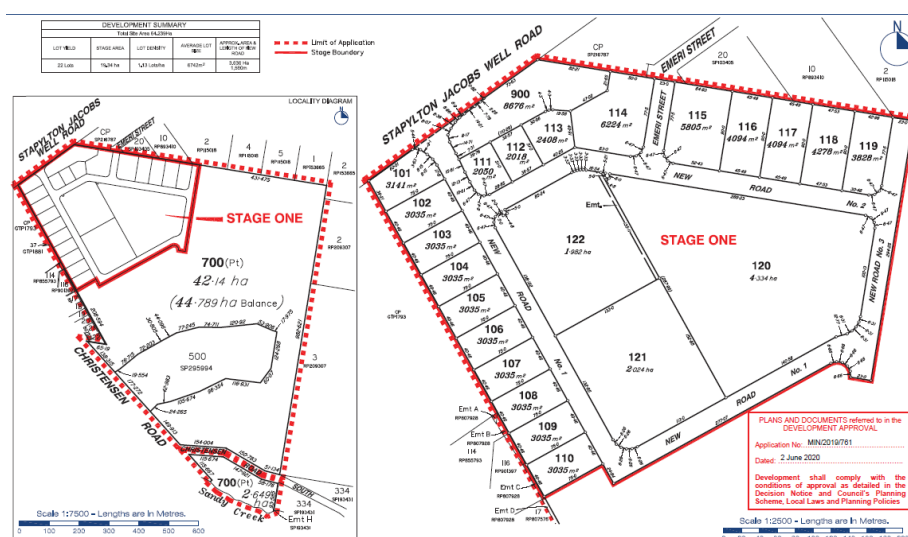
Stage 1 ROL Plan extract (GDP File, 2020)
